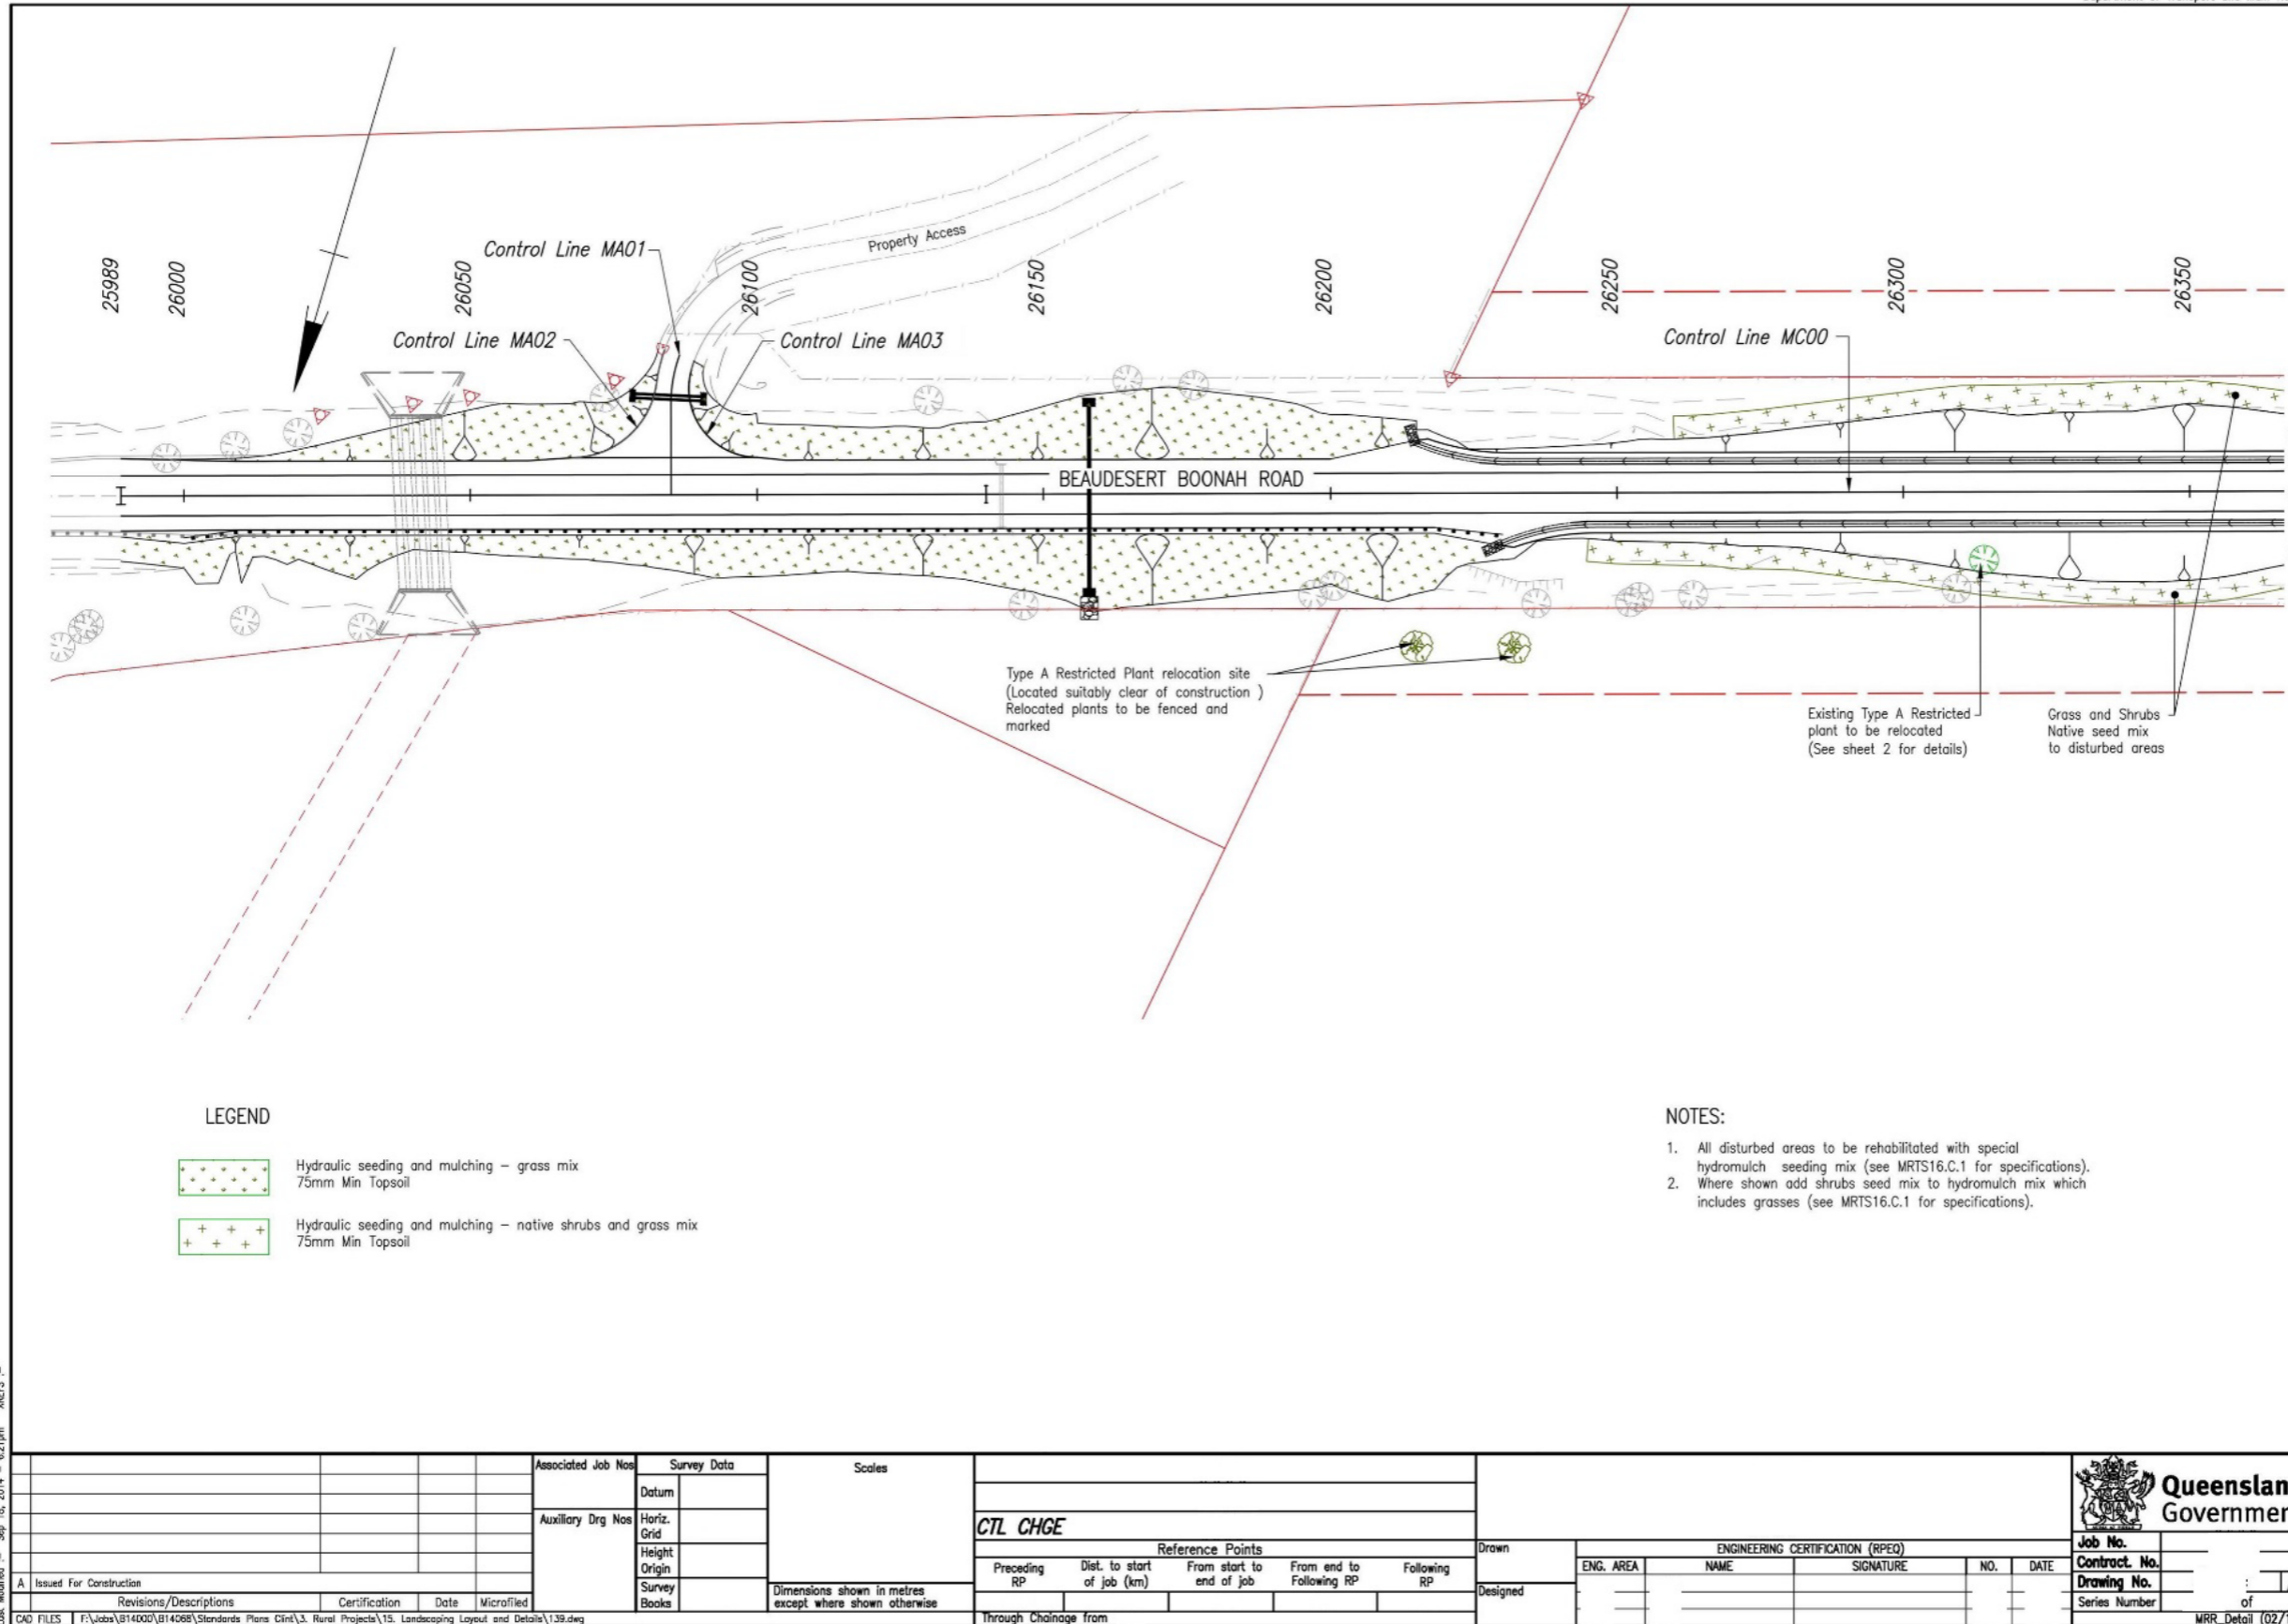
(b) – Landscaping details and layouts – generic example 2 – sheet 1 of 4
